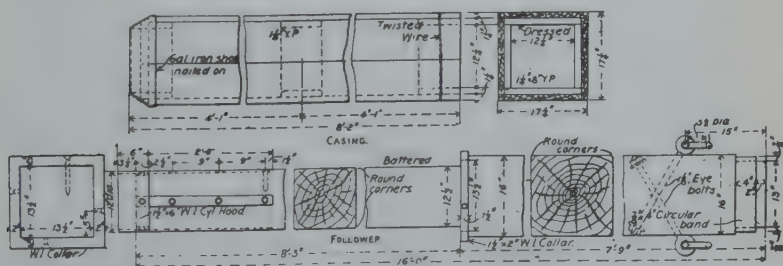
FORM AND BOX FOLLOWER FOR COMBINATION WOOD AND CONCRETE PILE.
